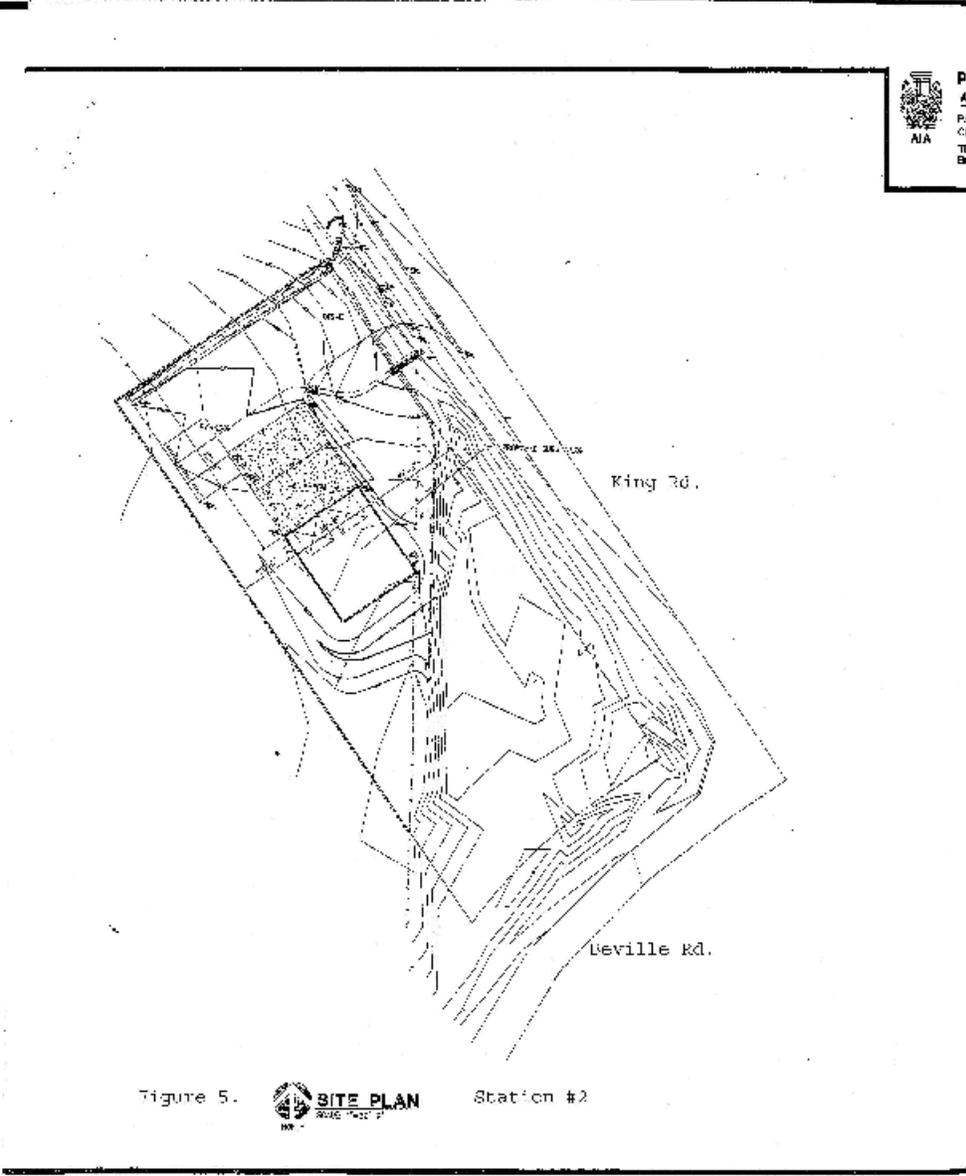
Station #2 Site Plan (double click on figure to enlarge and show detail)
